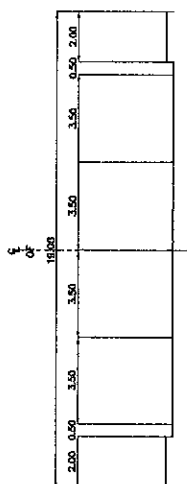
HORIZONTAL ALIGNMENT : J. R. BORJA EXTENSION ROAD
